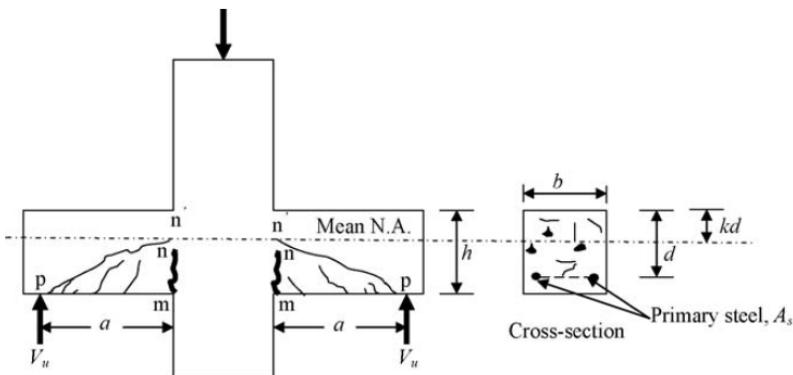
Typical cracks at shear failure of SFRC corbel without steel stirrups [71].
